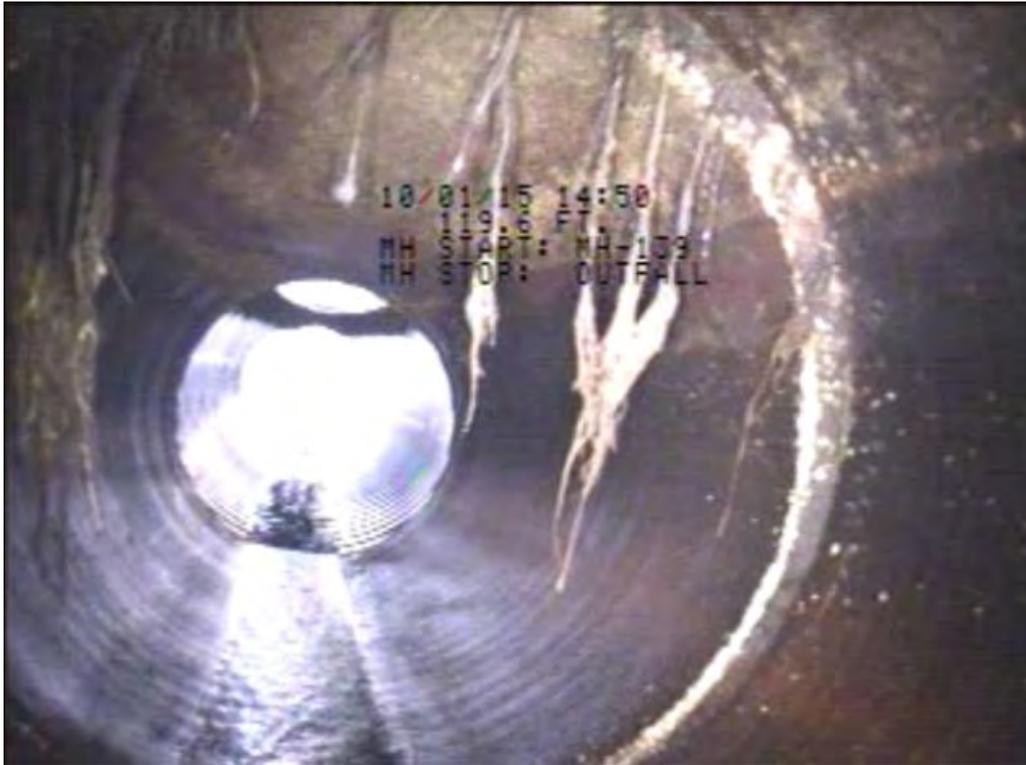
Area M: Root Intrusion (Culvert #139 - #Outfall)
